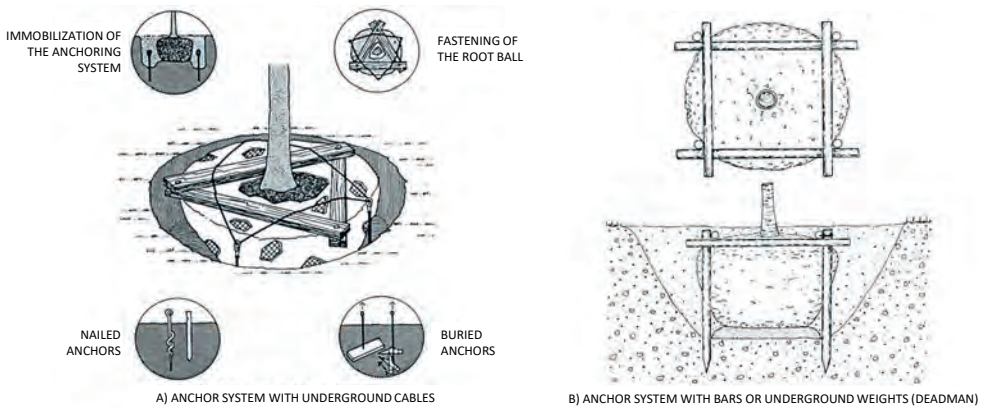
Examples of underground anchoring. NT08C of the Technical Standards for Gardening and Landscaping, COITAPAC
